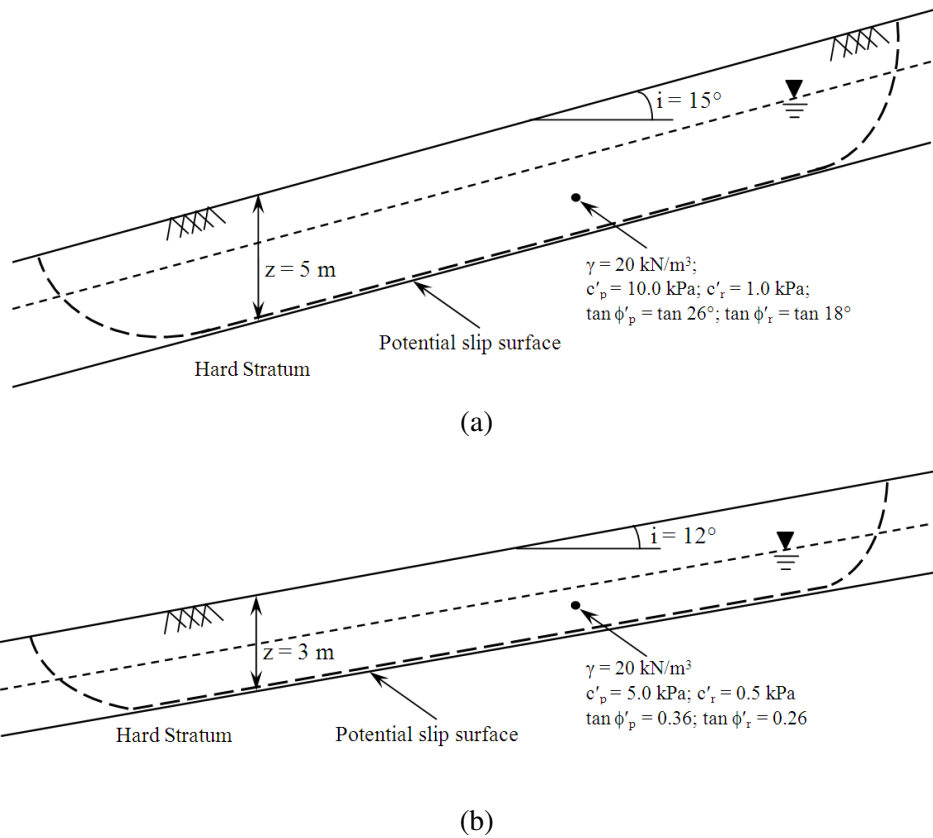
Slope Sections Considered in (a) Example 1, and (b) Example 2
